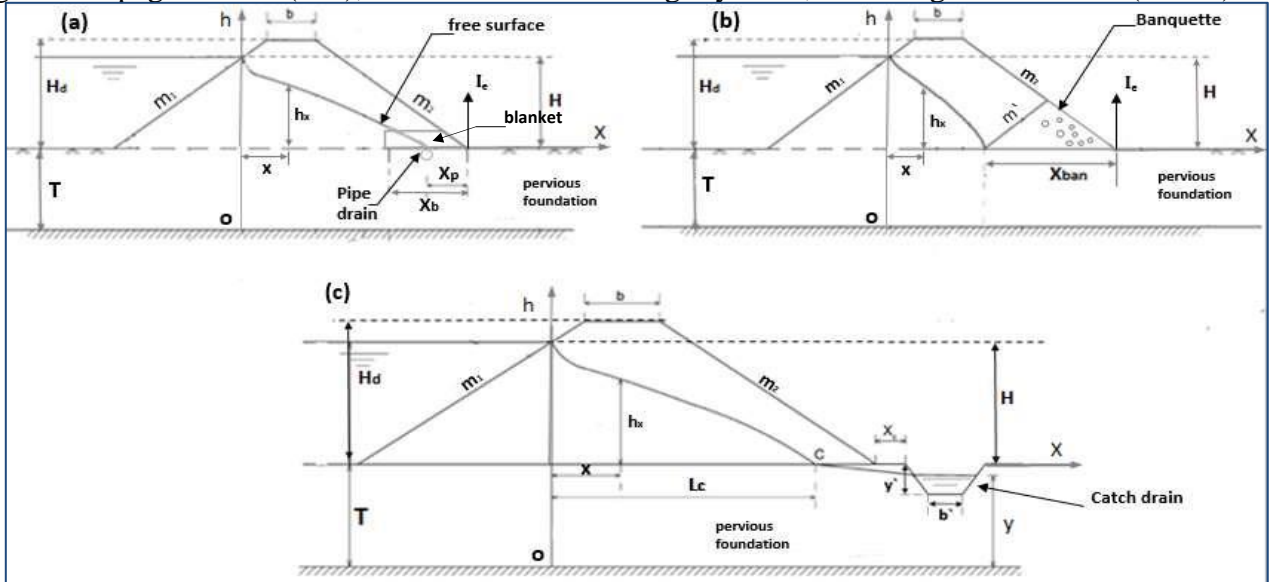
Studied toe drainage systems; a) drainage blanket with pipe drain, b) drainage banquette, and c) catch drain.
